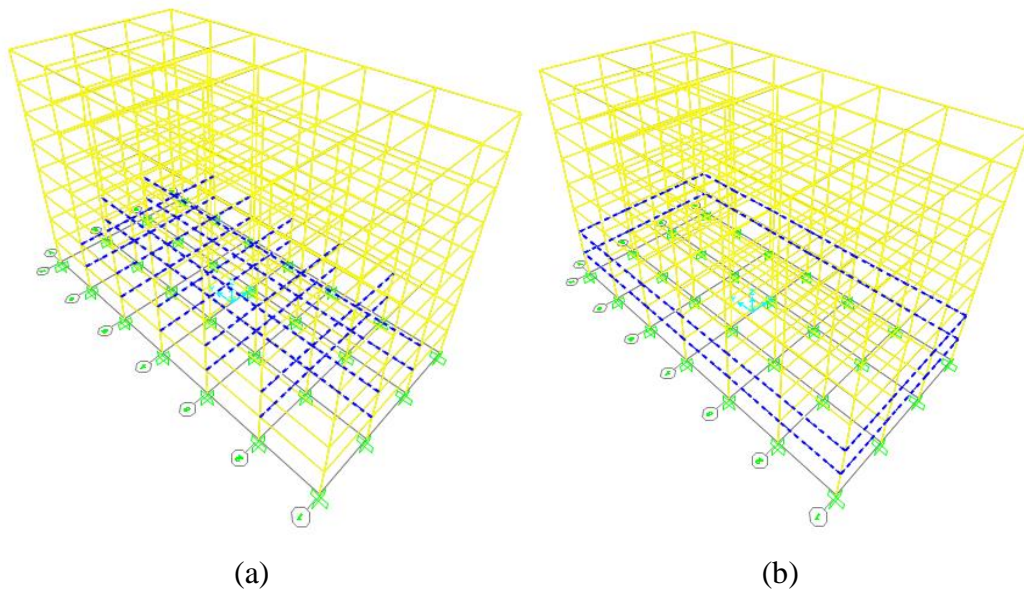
Beam member groups in the first two stories of the 584-member steel frame: (a) inner beams, (b) outer beams.
